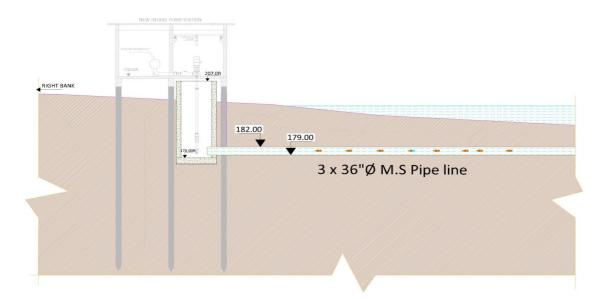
3x36" Dia MS Pipe as Gravity Conduit
